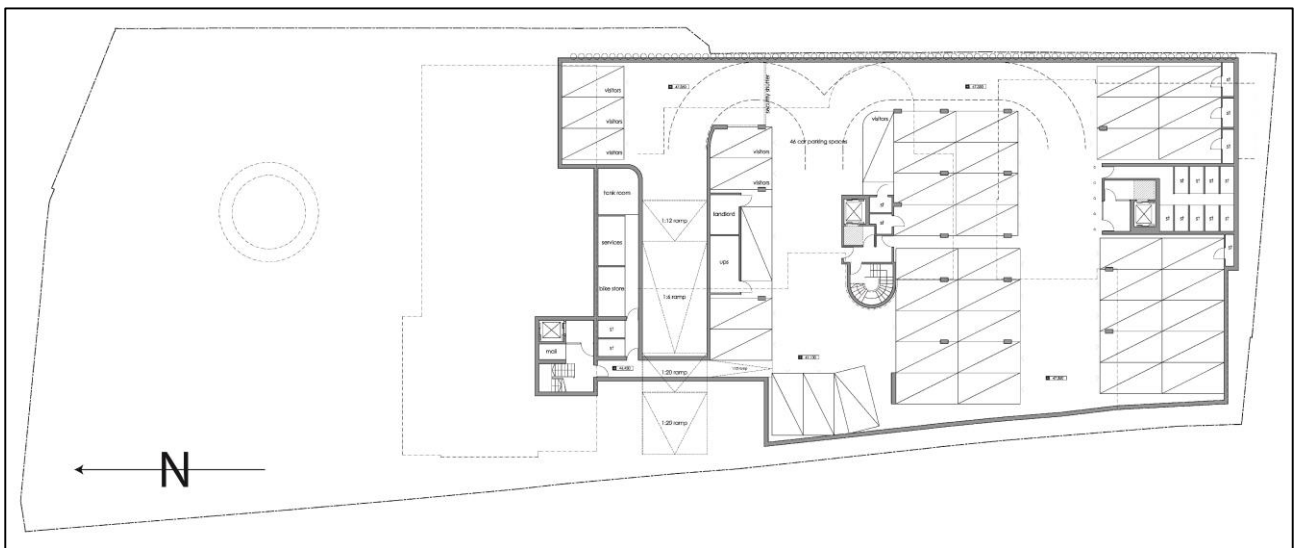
Basement (subterranean car park) plan. The basement will be beneath the footings of Apartment Block A and B and part of Apartment Block C (defined by the dashed outline to the right of Keppel Tower) (©Morris Architects). Note: Please refer to original architect drawings for full scaled and detailed information.
